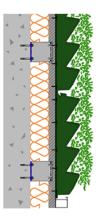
Container system attached to a wall by an aluminum substructure and wall brackets [99]
